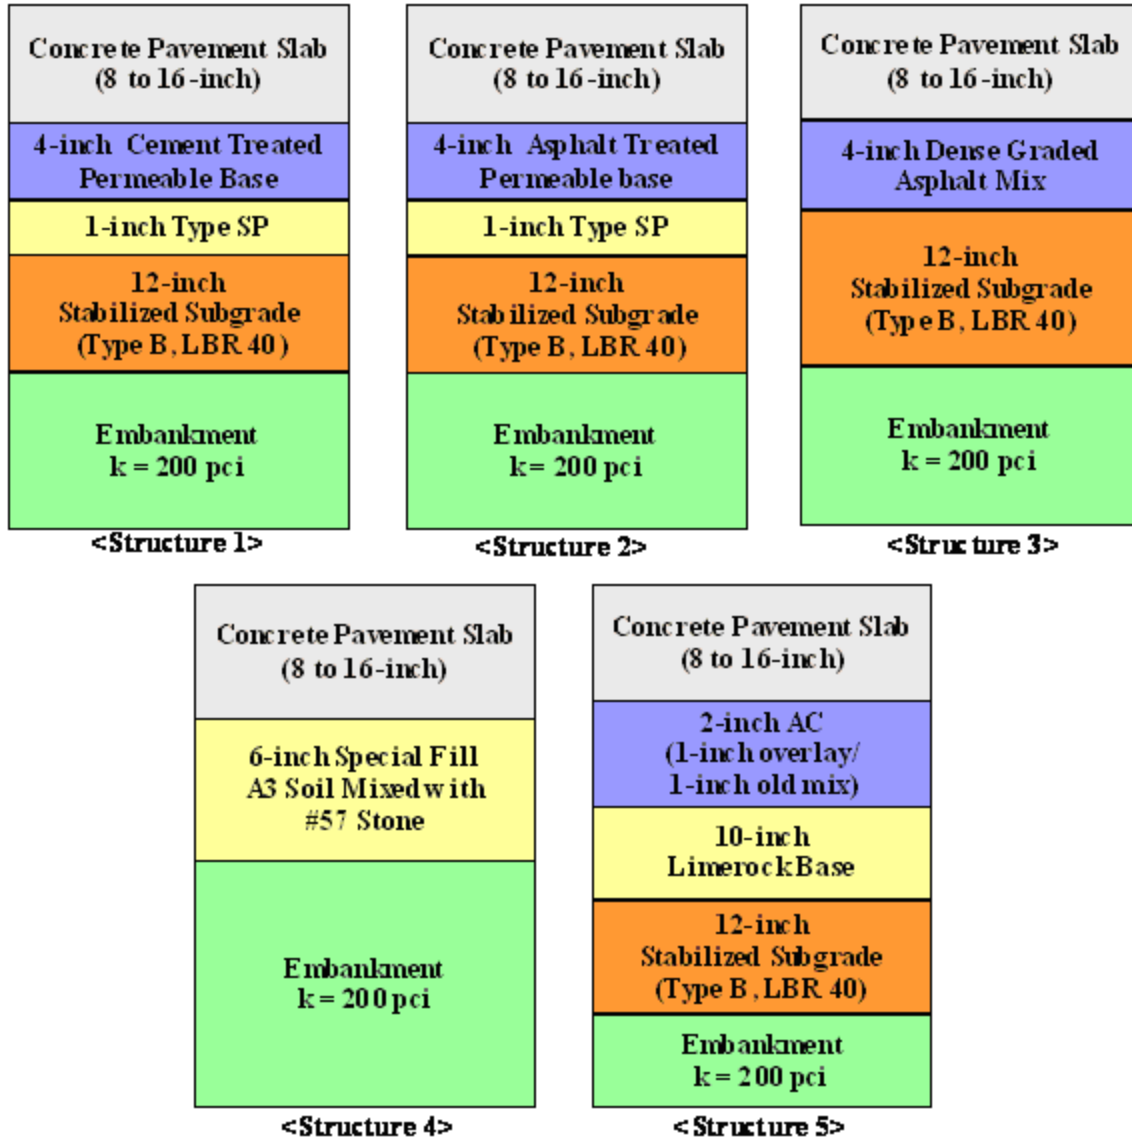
Rigid Pavement Cross-Sections Analyzed for Developing Design Tables.
